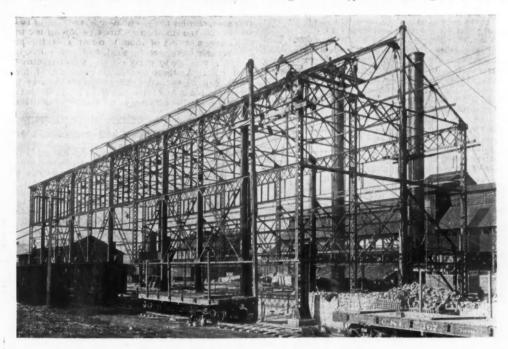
PIT FURNACE BUILDING, OHIO STEEL COMPANY.
